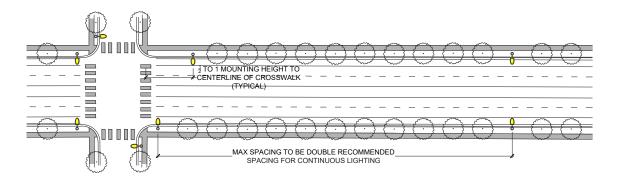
Typical Arterial with Non-Continuous Street Lighting Plan
